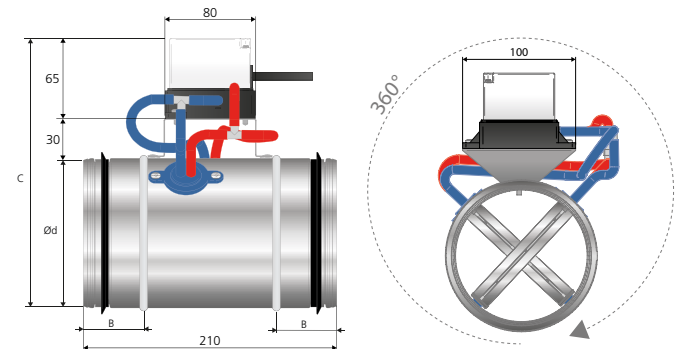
Dimensions (mm), REACT M circular. The damper can be installed at an optional angle.
